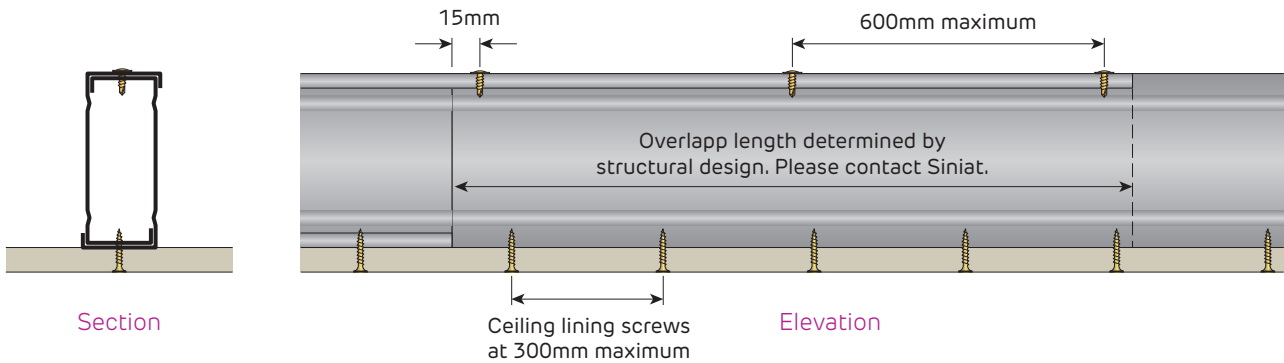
Splicing Steel Ceiling Studs via Overlap Method
